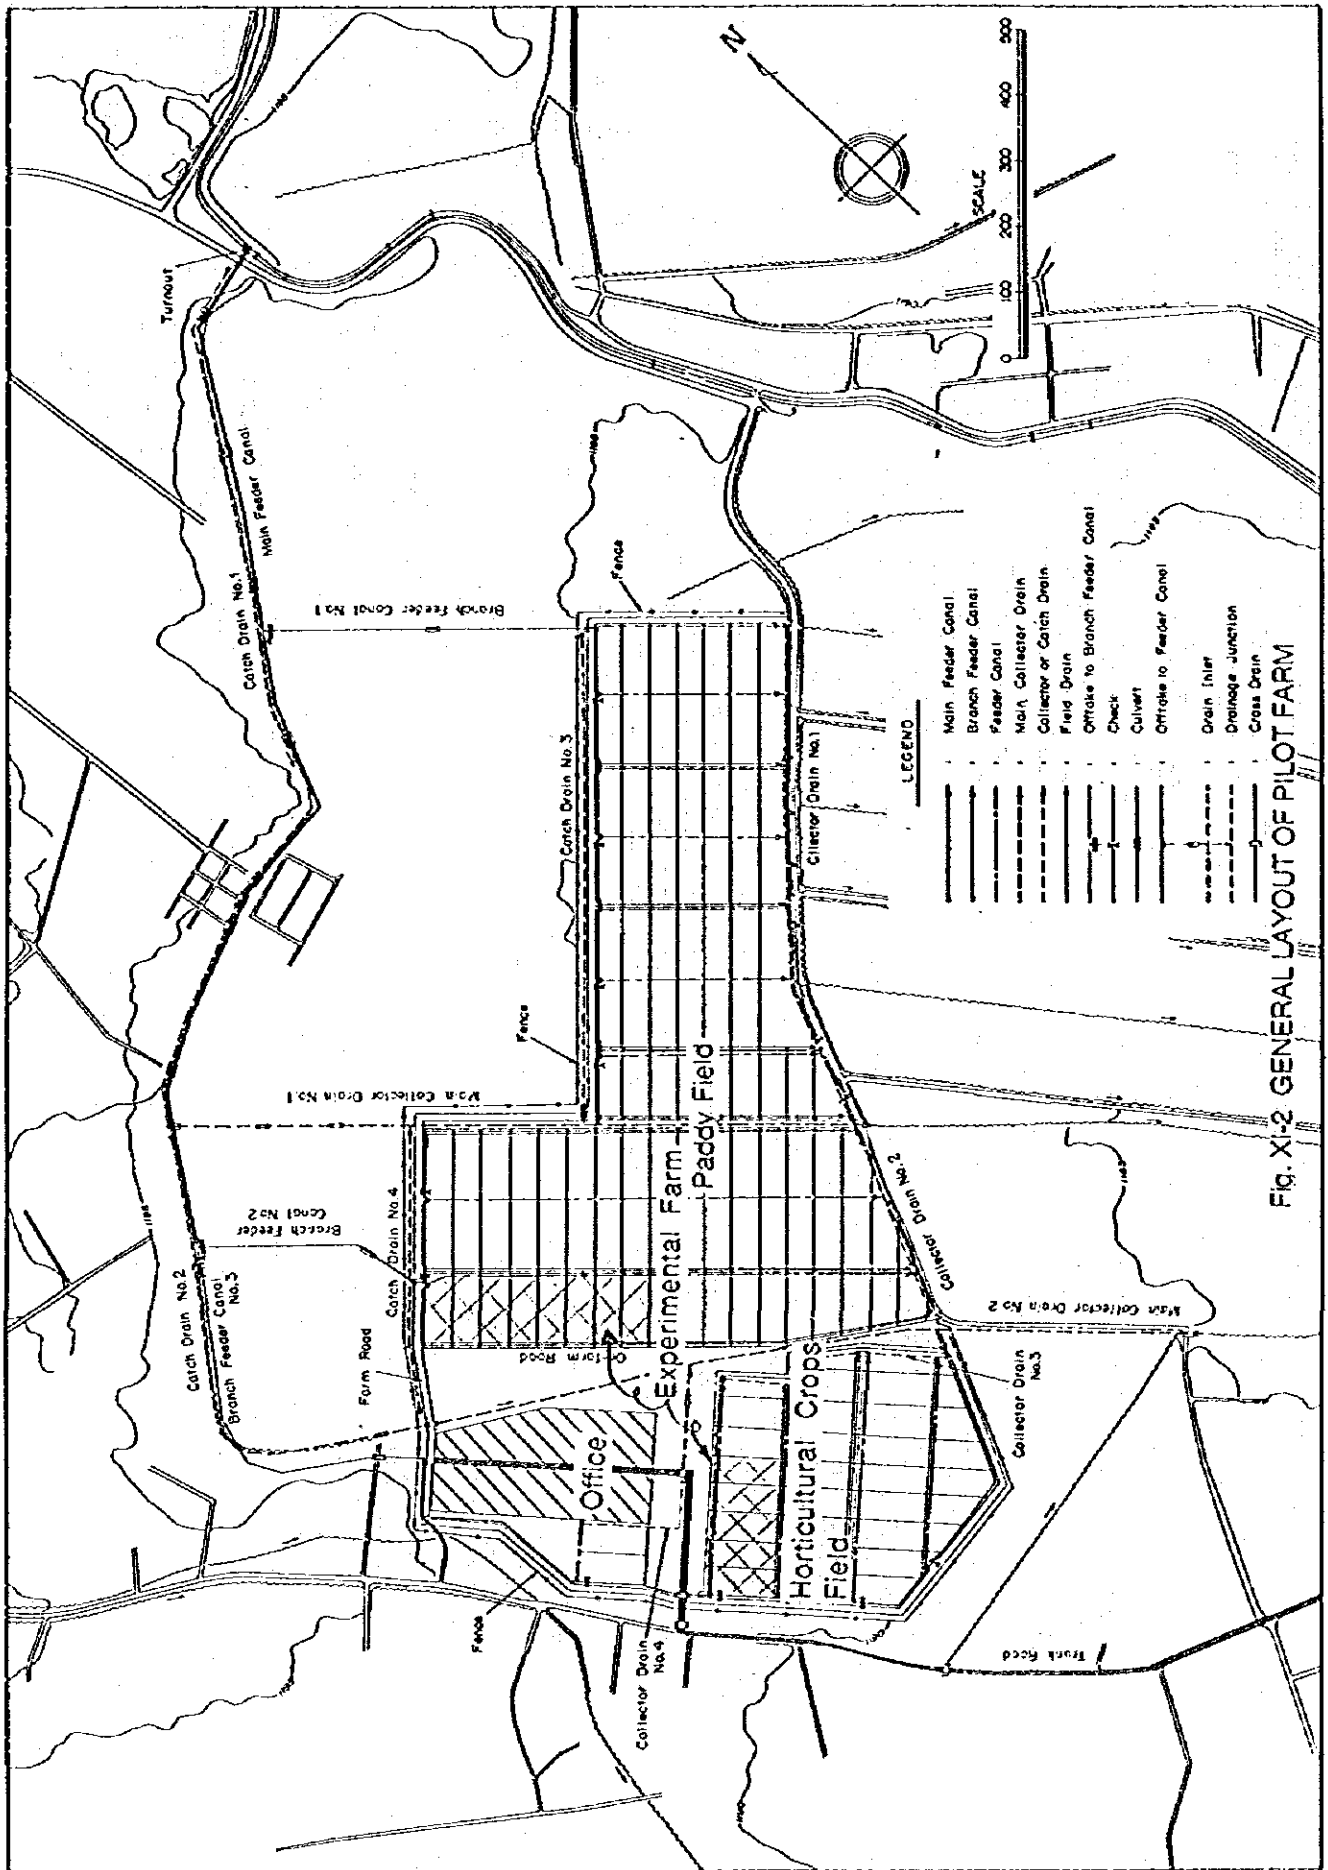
GENERAL LAYOUT OF PILOT FARM
